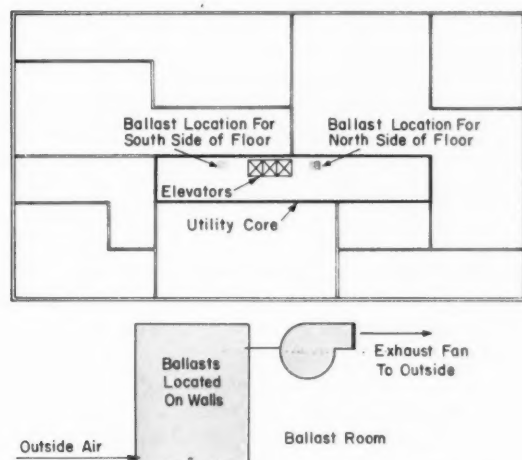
Isolating ballasts outside of air conditioned space and providing ventilation cuts the heat load.
